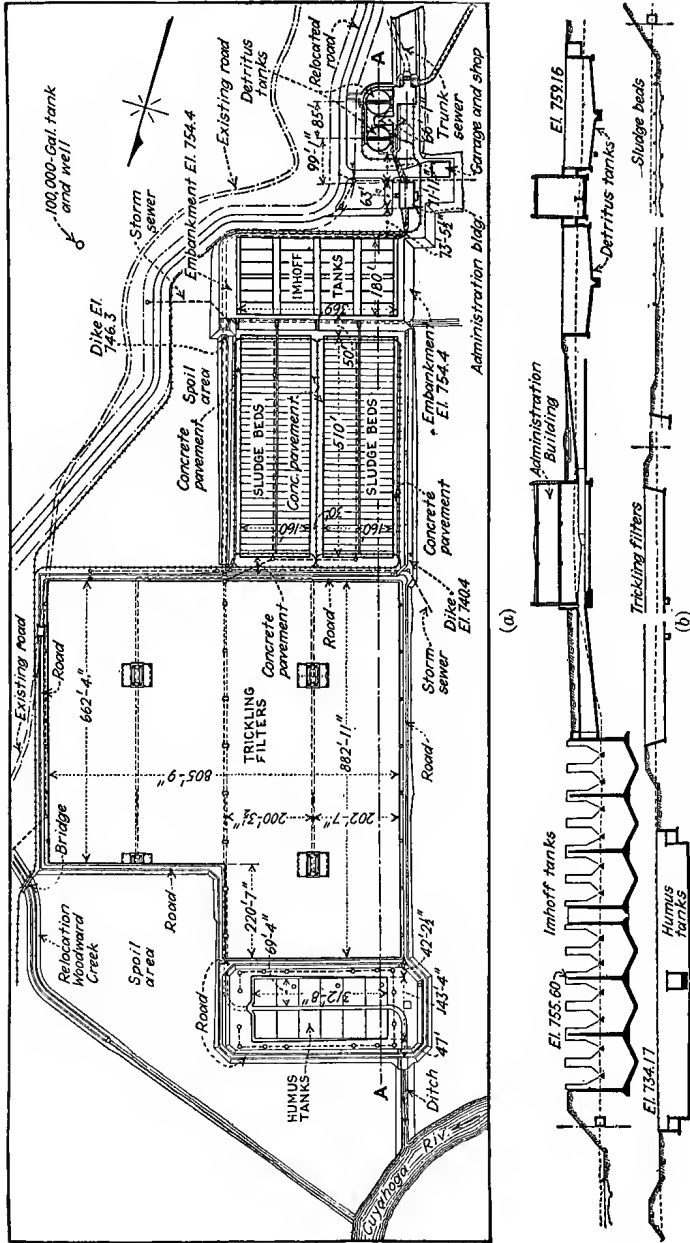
Trickling-filter plant at Akron, Ohio. (a) Plan; (b) diagrammatic longitudinal section.
